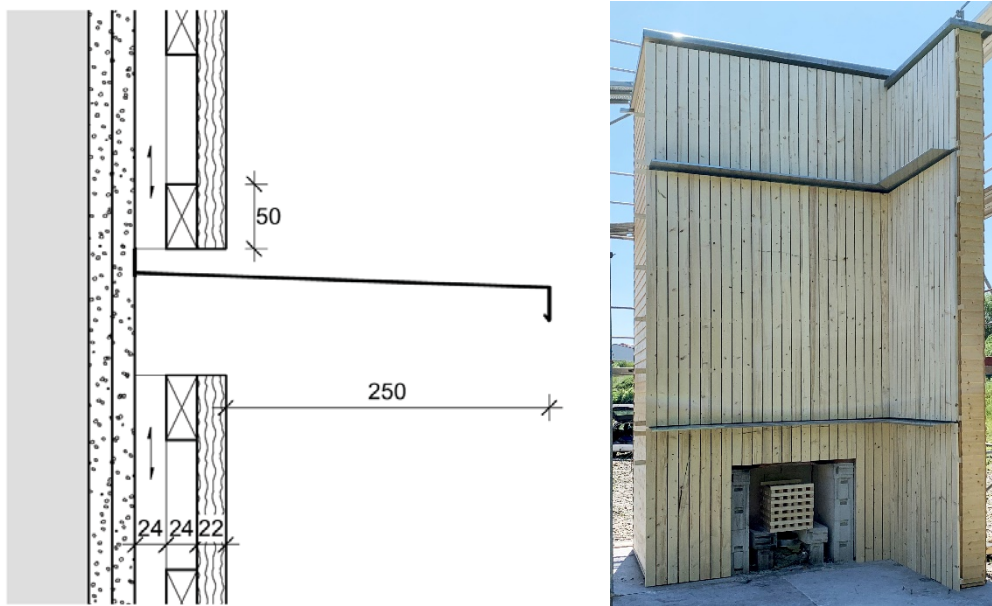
Vertical section and photo of the façade structure in Test 5 [in mm]
